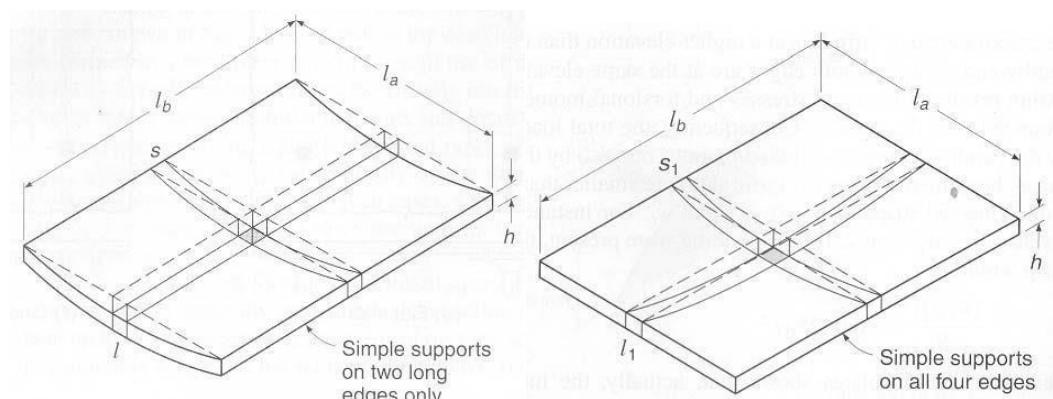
Diagrams of slab deflection in one way and two way slabs
